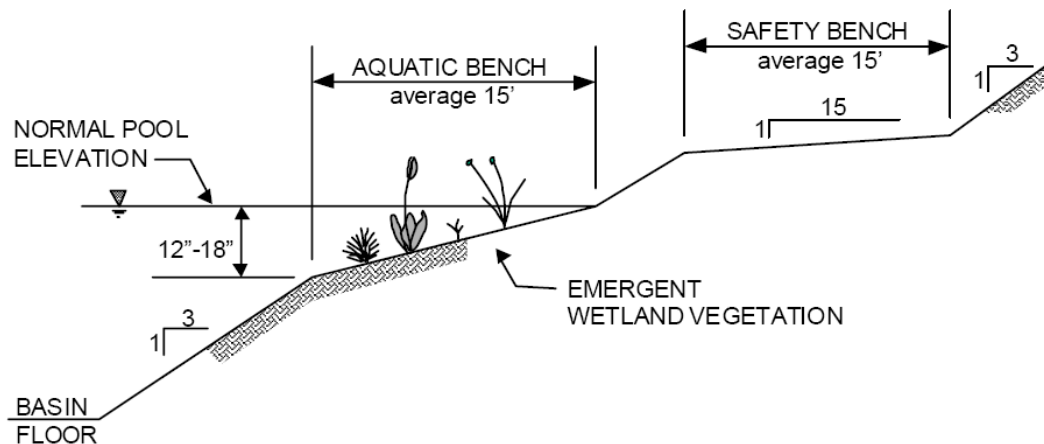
Typical Stormwater Pond Geometry Criteria
